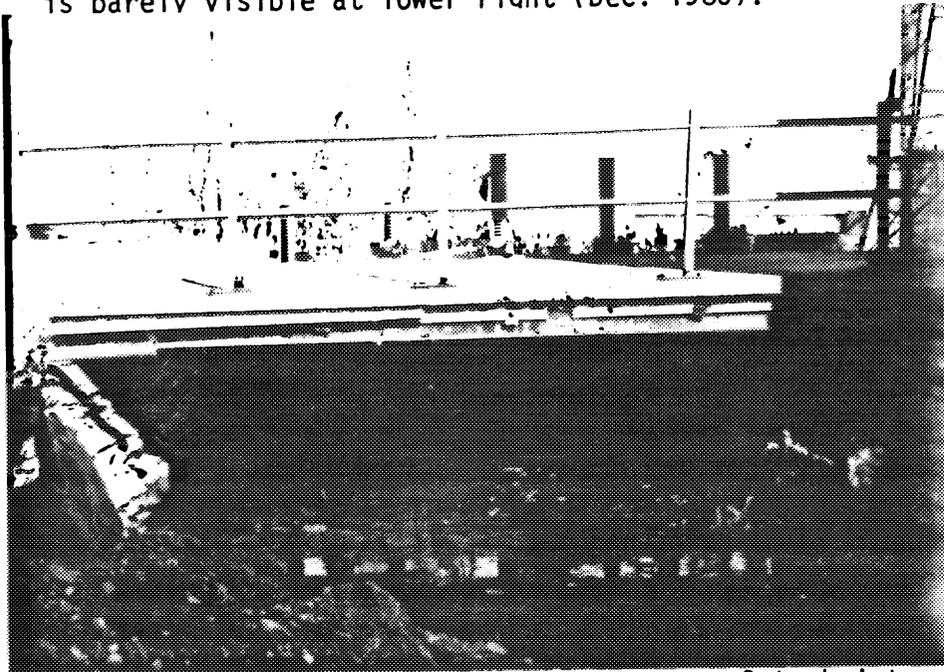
Outlet channel from downstream. Gate hoists are visible in background, fill just above building housing the turbine is visible at lower left (Dec. 1980).
